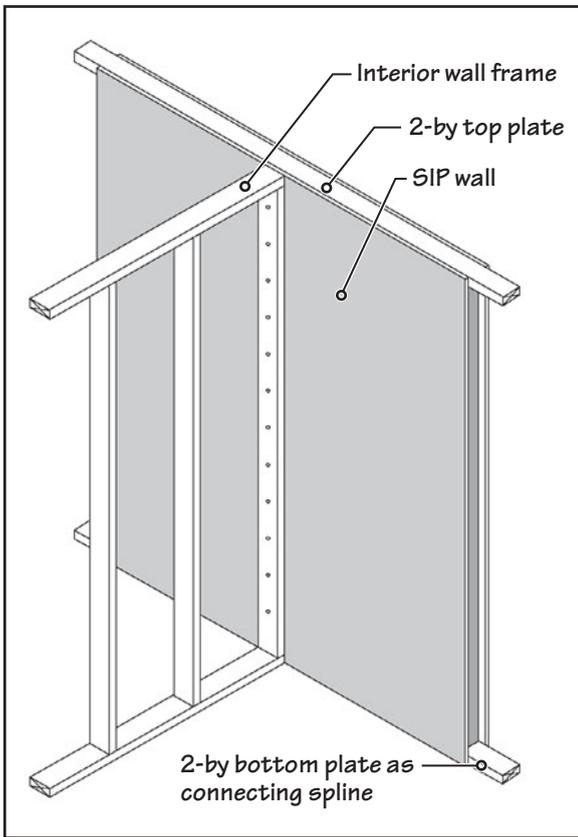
Connection of an interior wall to a SIP wall.
